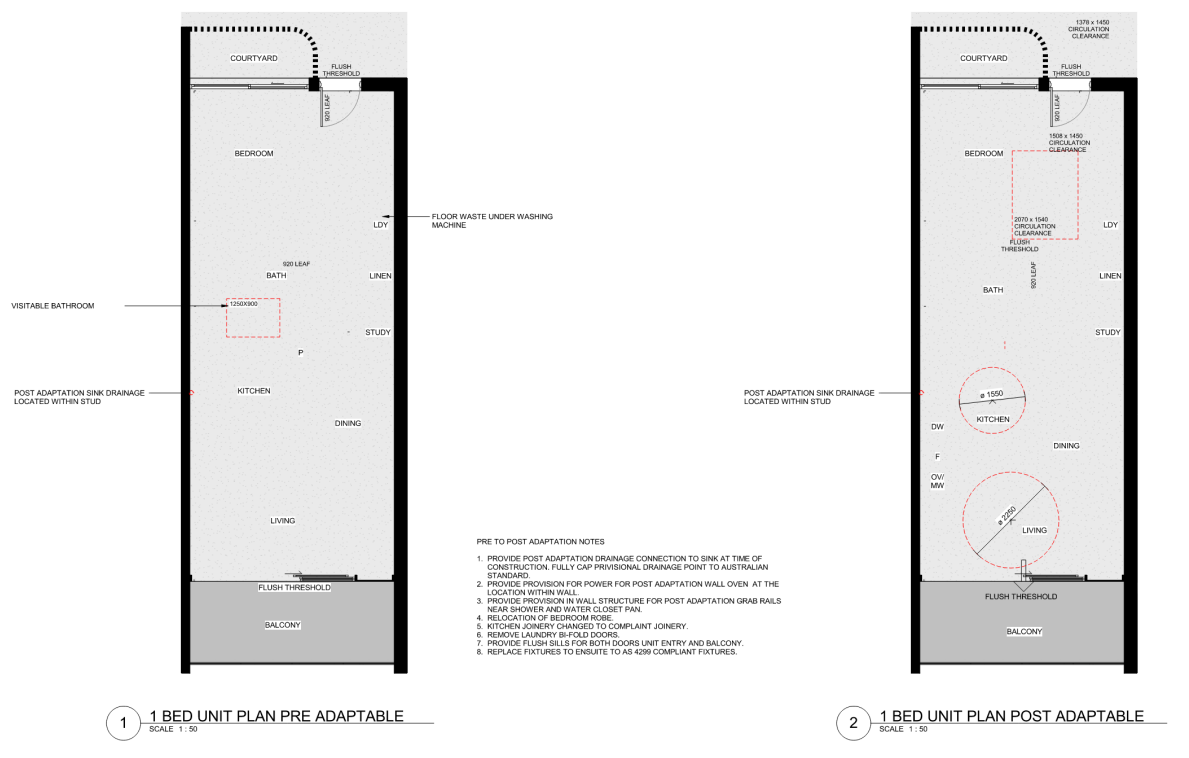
One bedroom apartment type 1 (pre/post adaptation)
